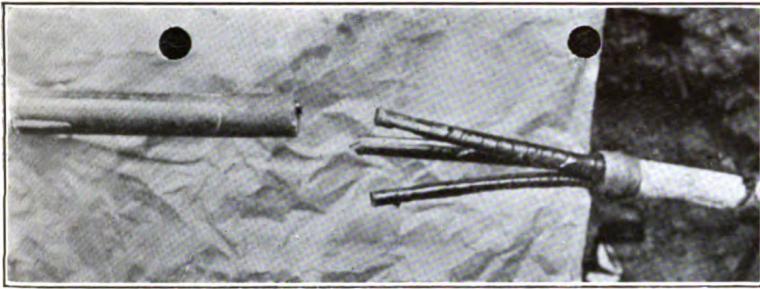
CABLES SHOWING ONE END READY FOR JOINT [NIMS]
